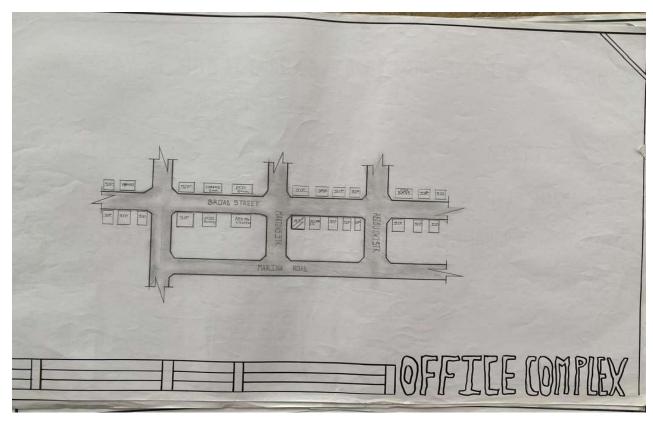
SHOWING THE LOCATIONAL PLAN OF CASE STUDY ONE
